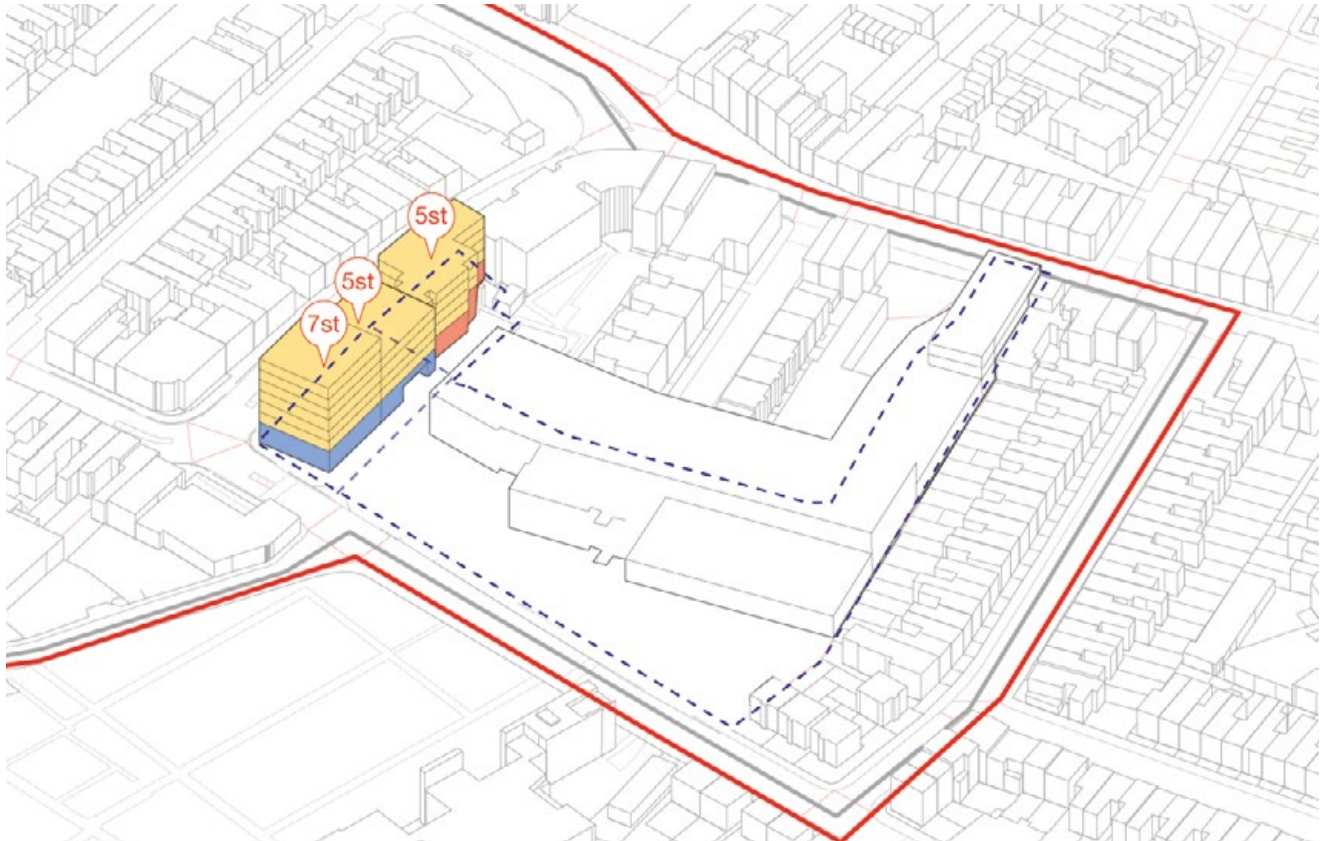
Proposed Massing BSSA5 indicating 5-7 storeys (15m-21m). Hawkins\Brown Masterplan Report
